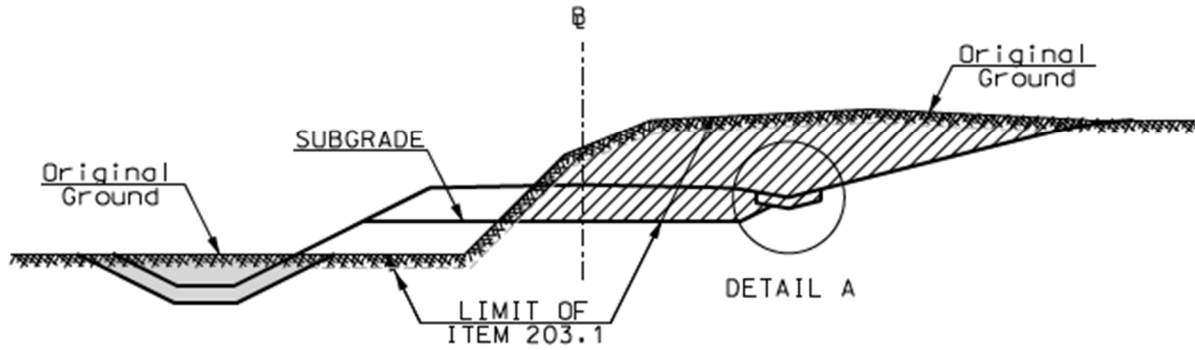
shows an example of when to pay for roadway ditch excavation. Additional information describing excavation pay limits can be found in the *Standard Specifications Section 206*.
